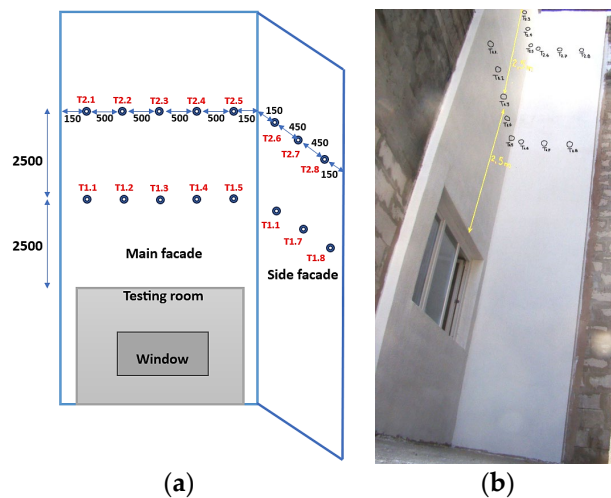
(a) Thermocouples positioning on façade (dimensions in mm) (source: own elaboration, inspired by BS 8414) [3,4]; (b) photo of the experiment location.
